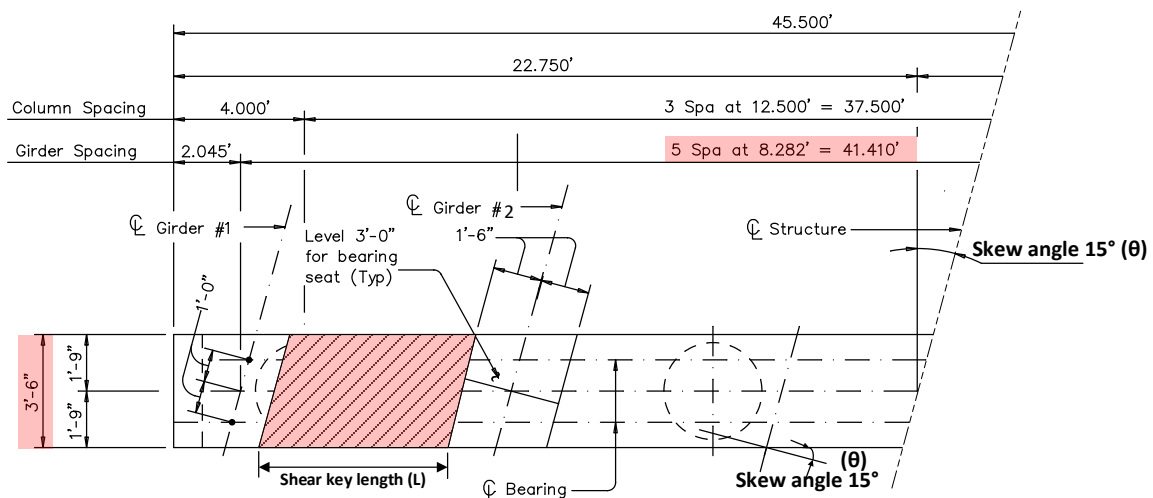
Bent cap for 44-ft roadway 15-degree skew I-girder bridge
